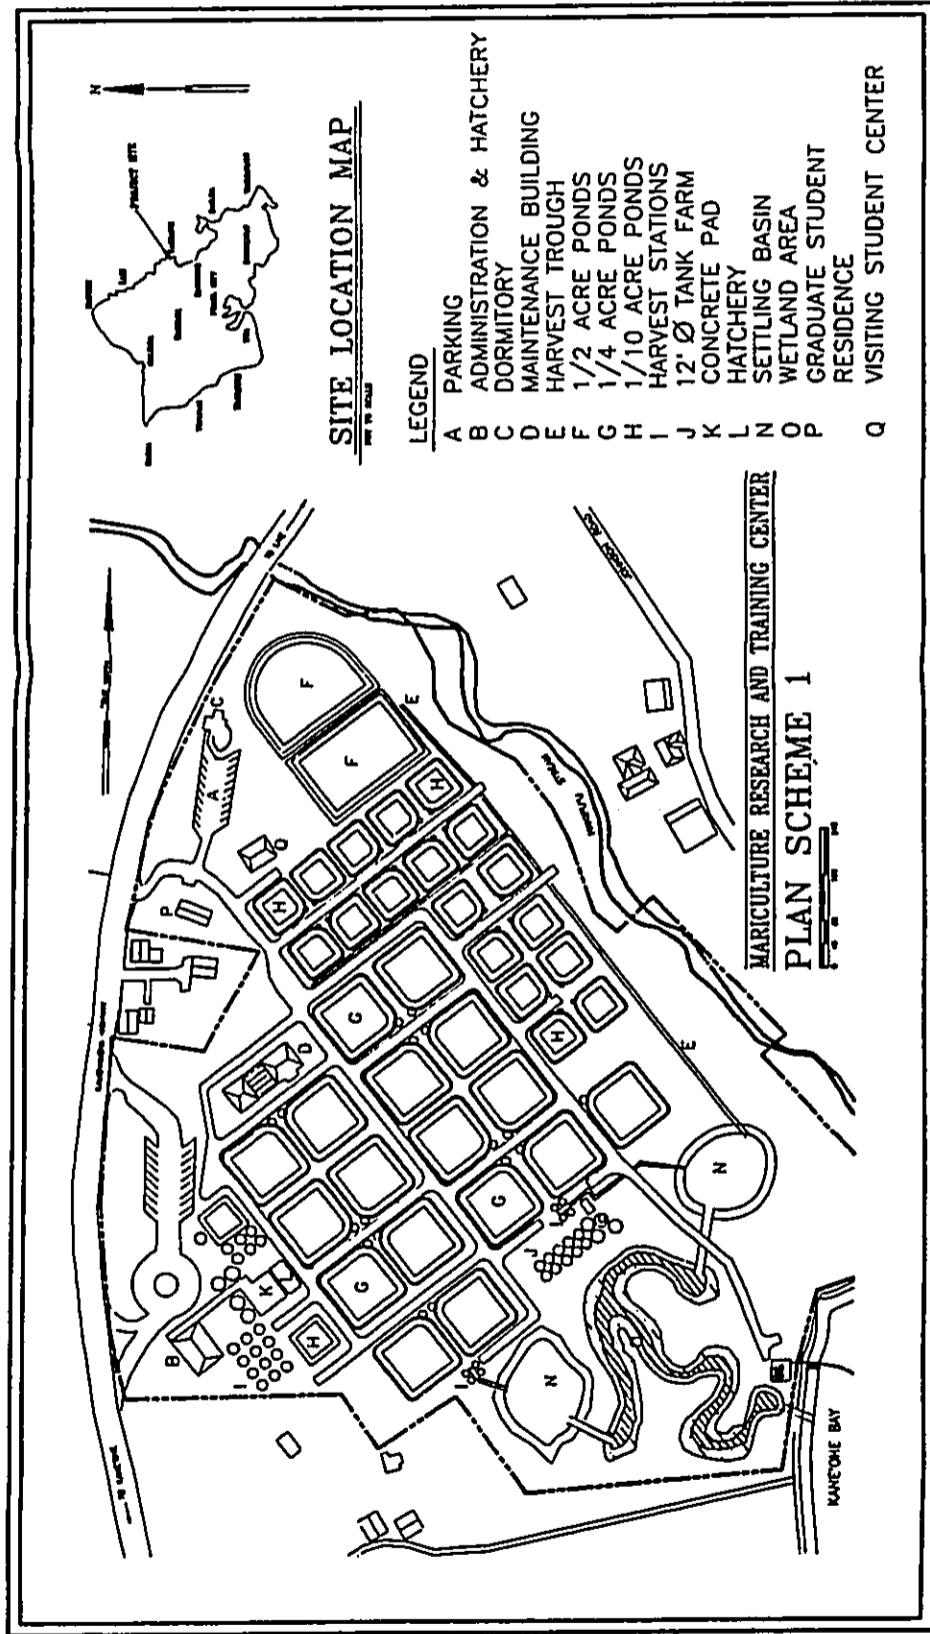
FACILITY LAYOUT - SCHEME 1
